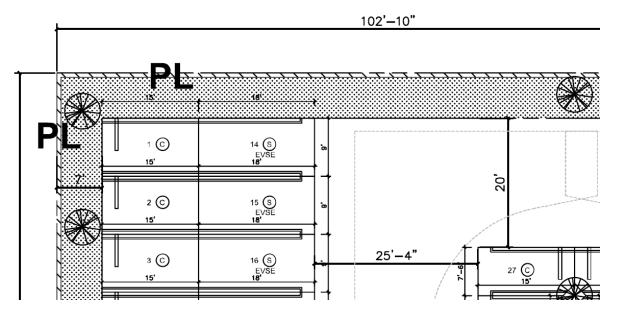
Typical western yard showing a minimum 7-foot landscape buffer, with an additional 33-feet before any driveway.
